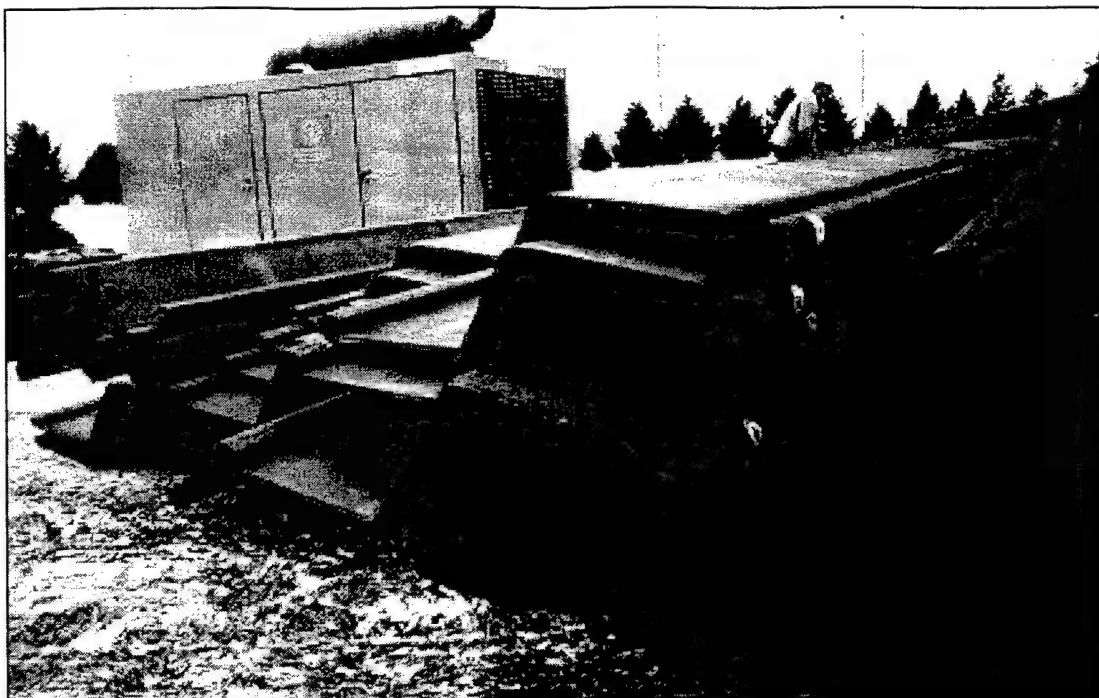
Photograph of Waterloo Barrier Sheet Pile.
